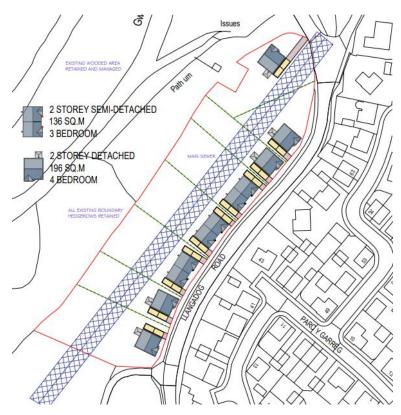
Proposed Indicative Site Layout Plan for Representation Site
